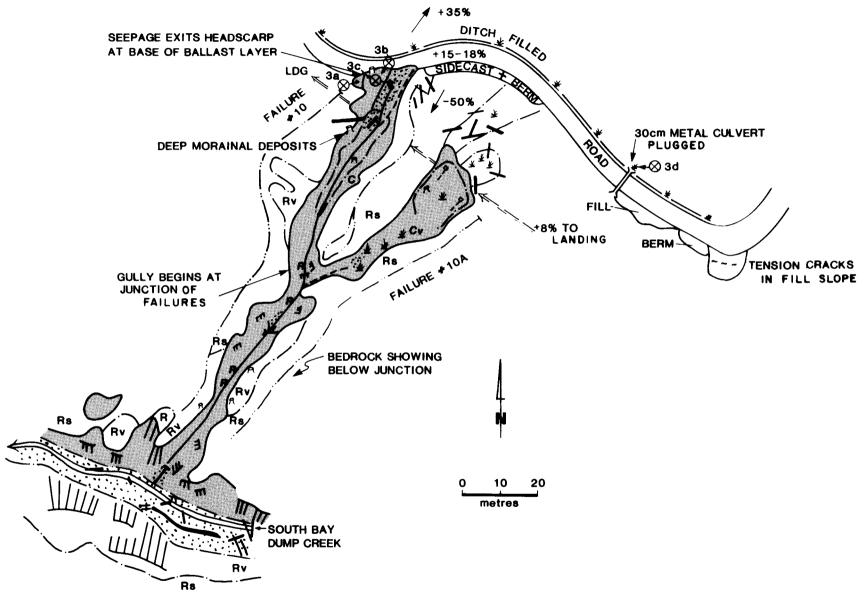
Diagram of Example #3, South Bay Dump Creek. (Failure #10, L13-116/115)
